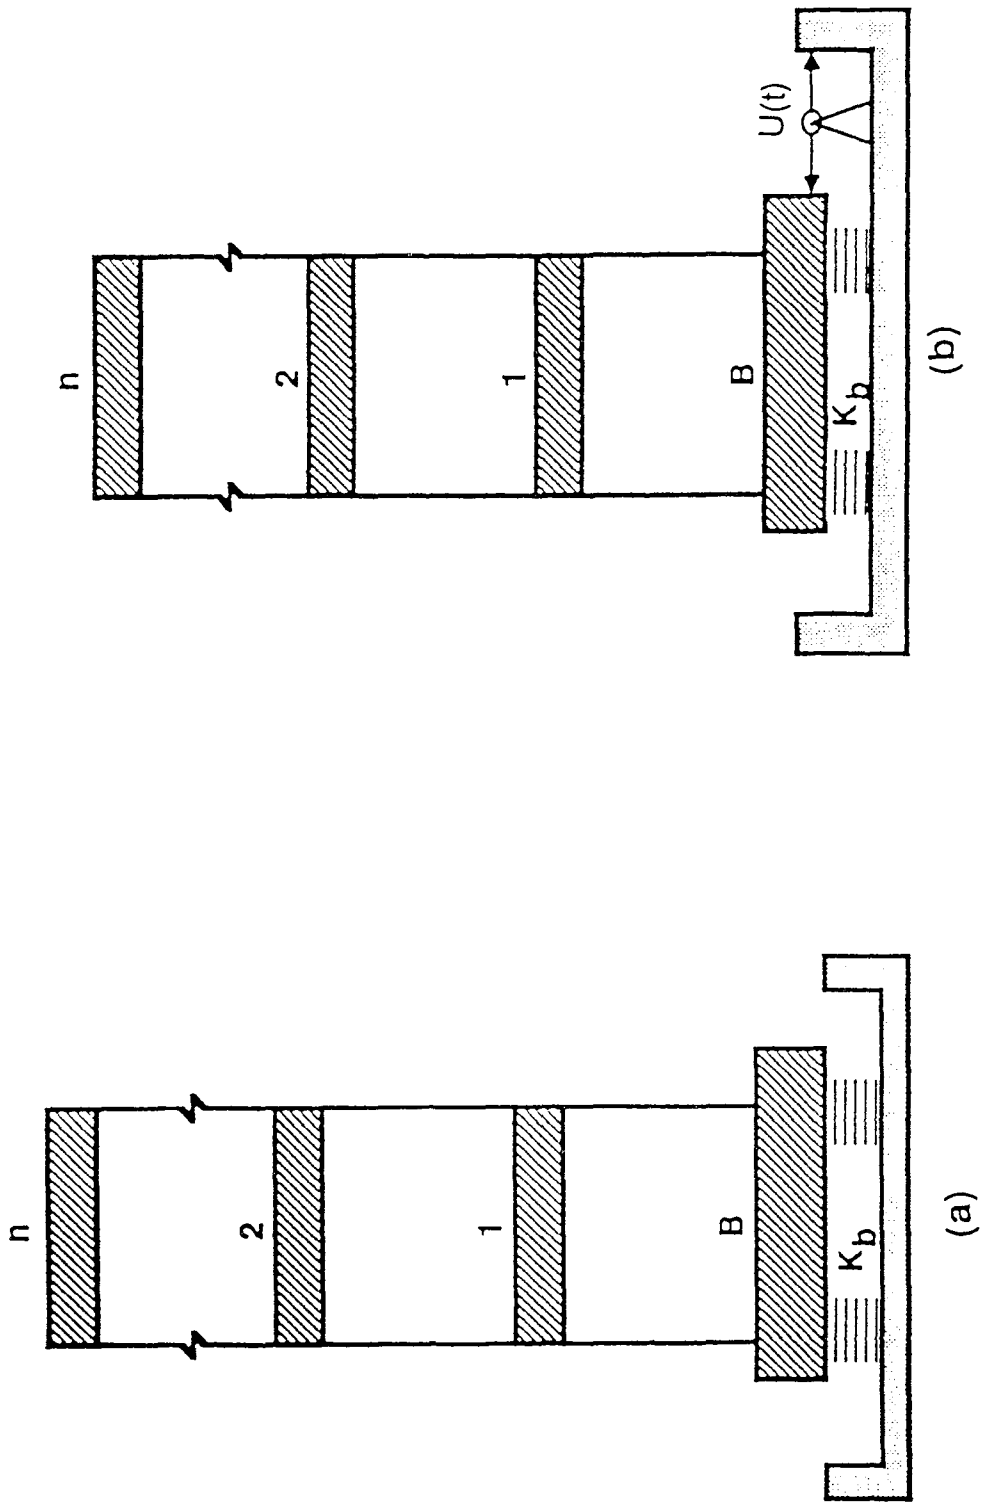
Structure Model of a Multi-Story Building: (a) With Base Sliding System; (b) With Base Sliding System and Actuator
